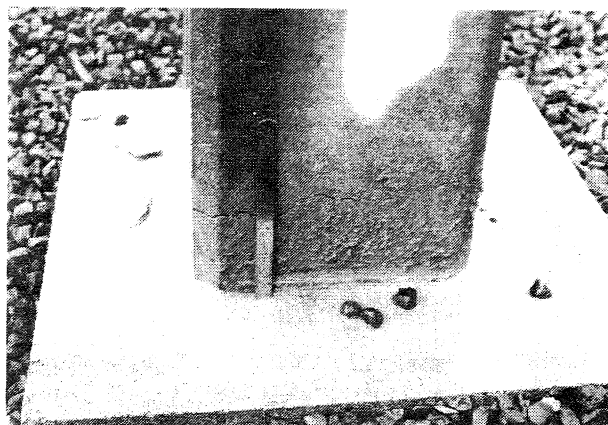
The base of a concrete pillar supporting an airbreak switch. This crack is smaller than a major crack and is typical of an intermediate crack.
